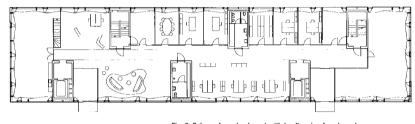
Column-free plan layout with loadbearing facade and cores (lifts, wet rooms or stairs) Bearth & Deplazes: ÖKK offices, Landquart (CH), 2001/02
